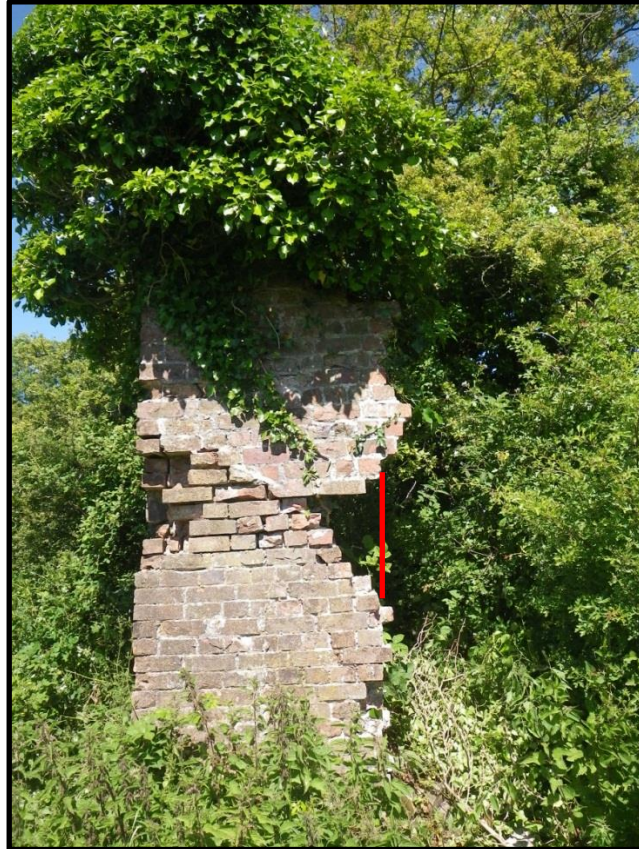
SE corner of Building A. Red line shows edge of area to be re-built.
